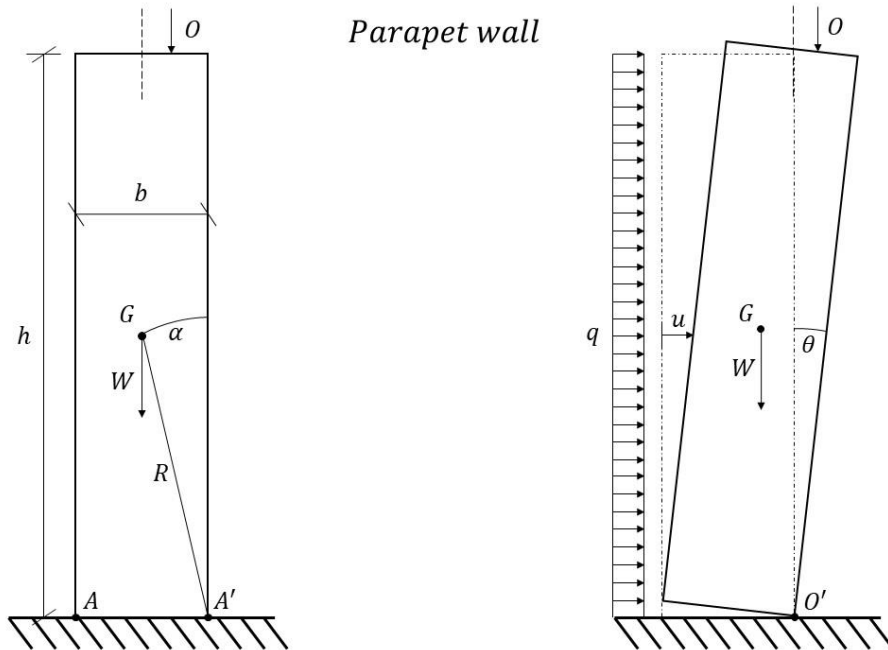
Parapet wall as a single rigid body with a rocking behaviour at rest (left) and at its deformed shape (right)
